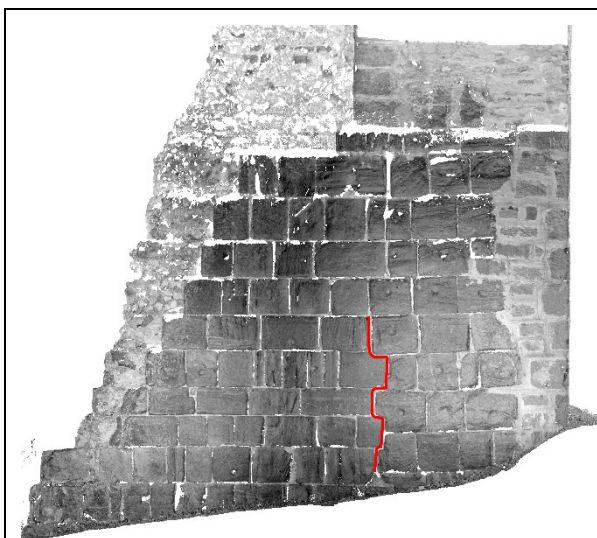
P2-N, shifted horizontal joints with collision of masonry of pillar and supporting wall
